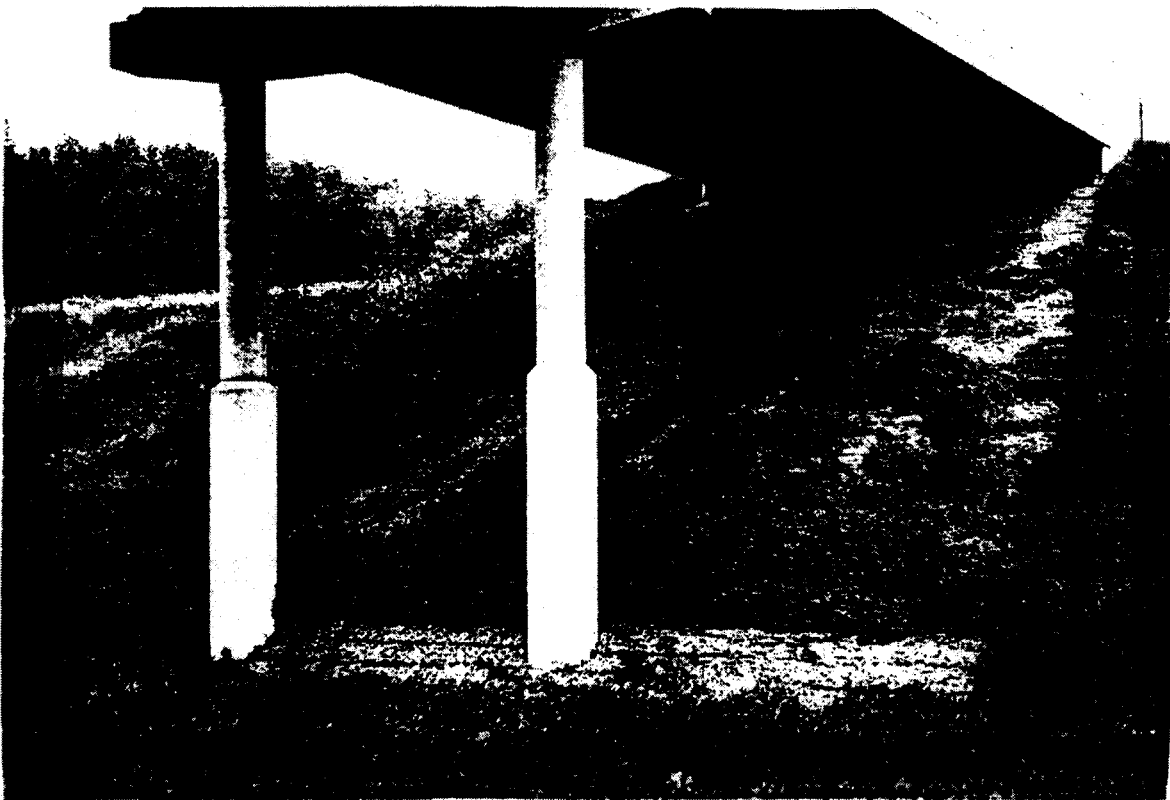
Gabions Used to Protect Bridge Piers from Scour.
